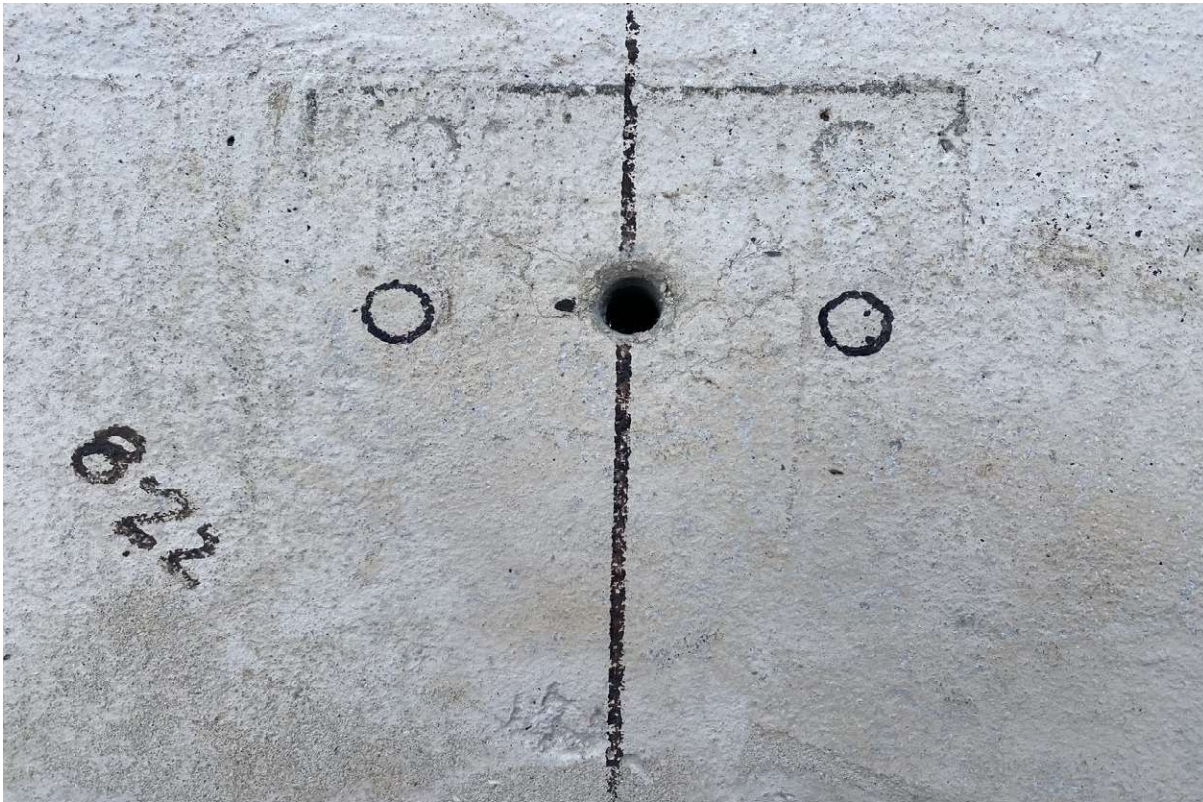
P-SE1c-2 specimen concrete after cyclic loading
